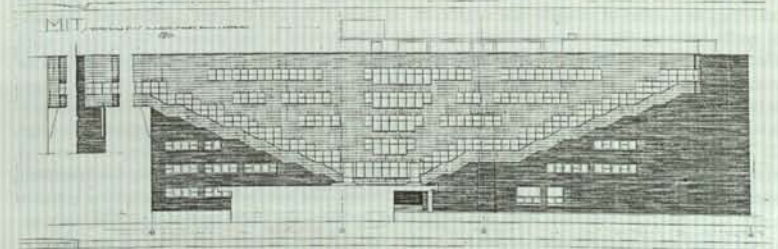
North wall elevation showing tile cladding (A.A. Archive - no date)
